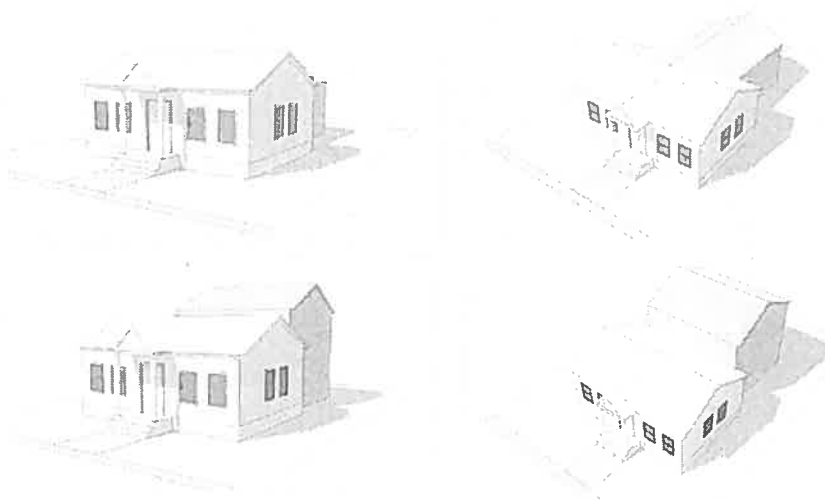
Required side wall articulation through stepdown (top) or variation in wall plan (bottom).
